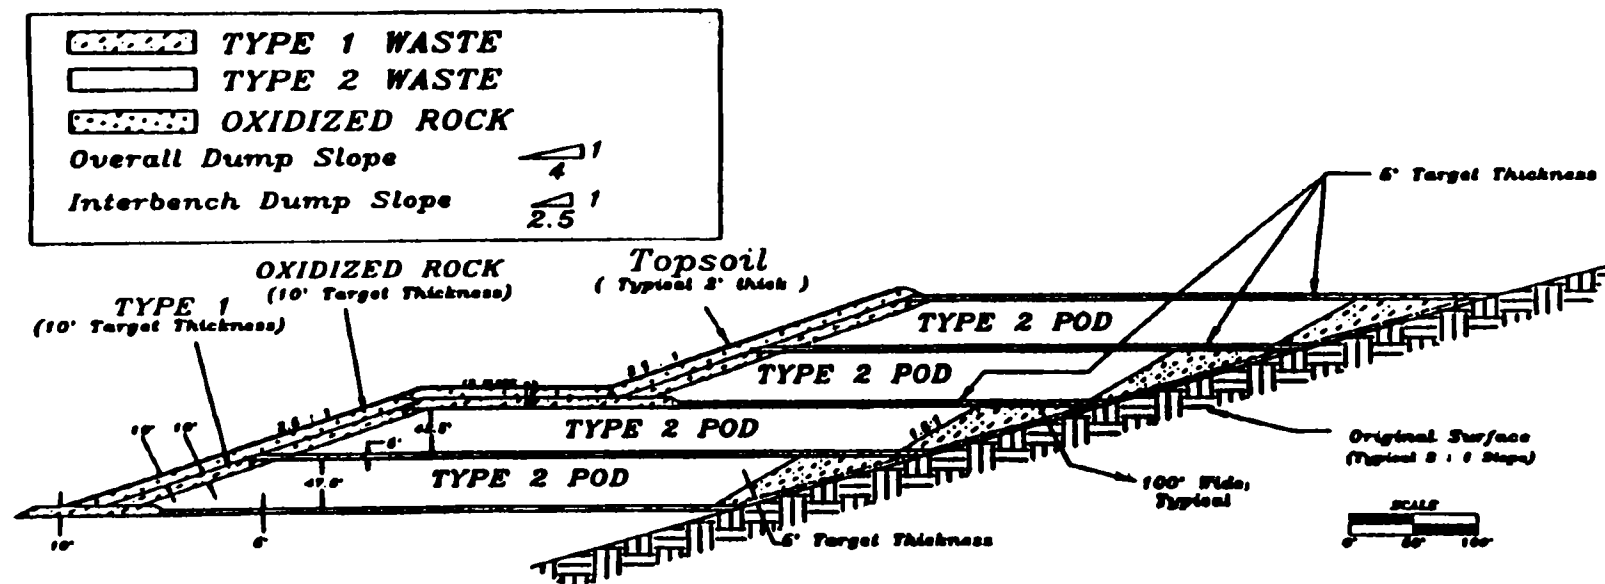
Inter Barrier Construction at the McLaughlin Mine Waste Rock Piles
